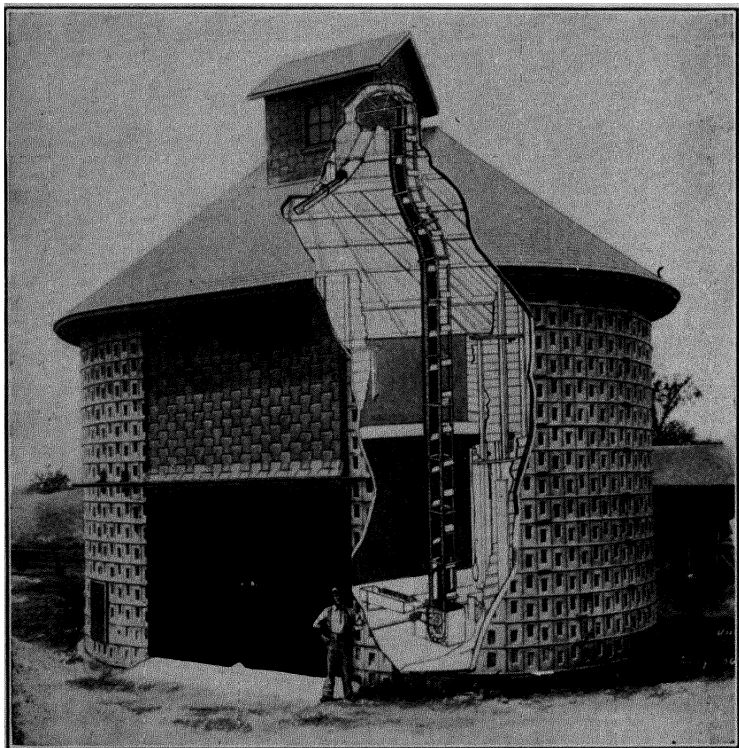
Illustrating inside elevator in a cement stave corn crib.
